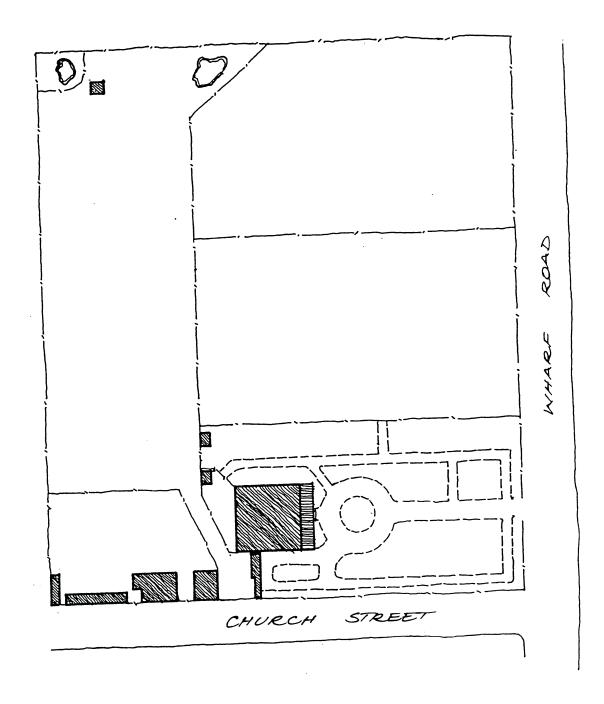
Broughton House, 1842 Plan Source: DPWS 1991
